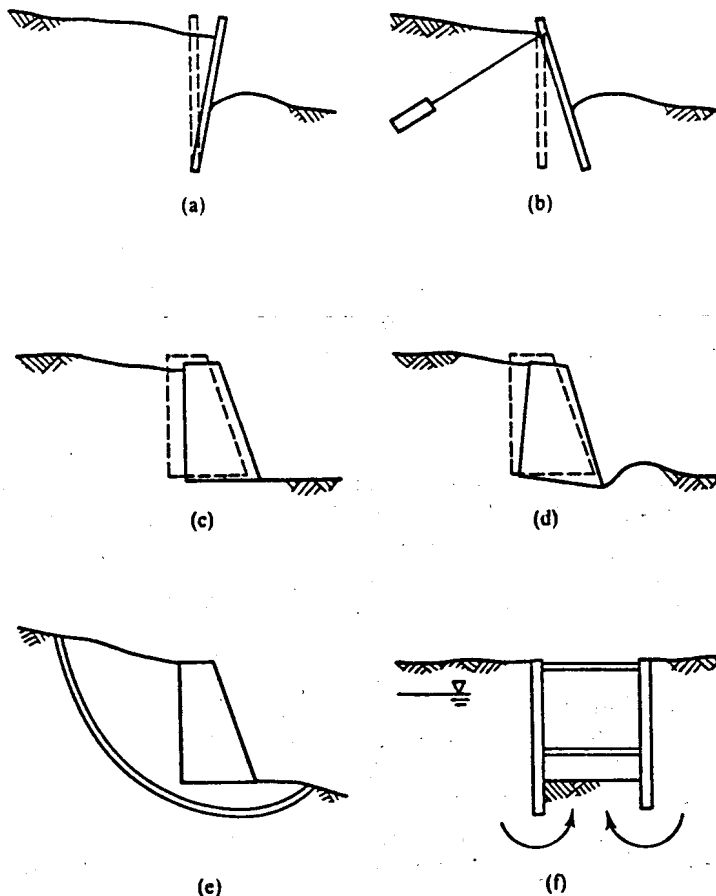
Mechanisms of failure of retaining walls.
